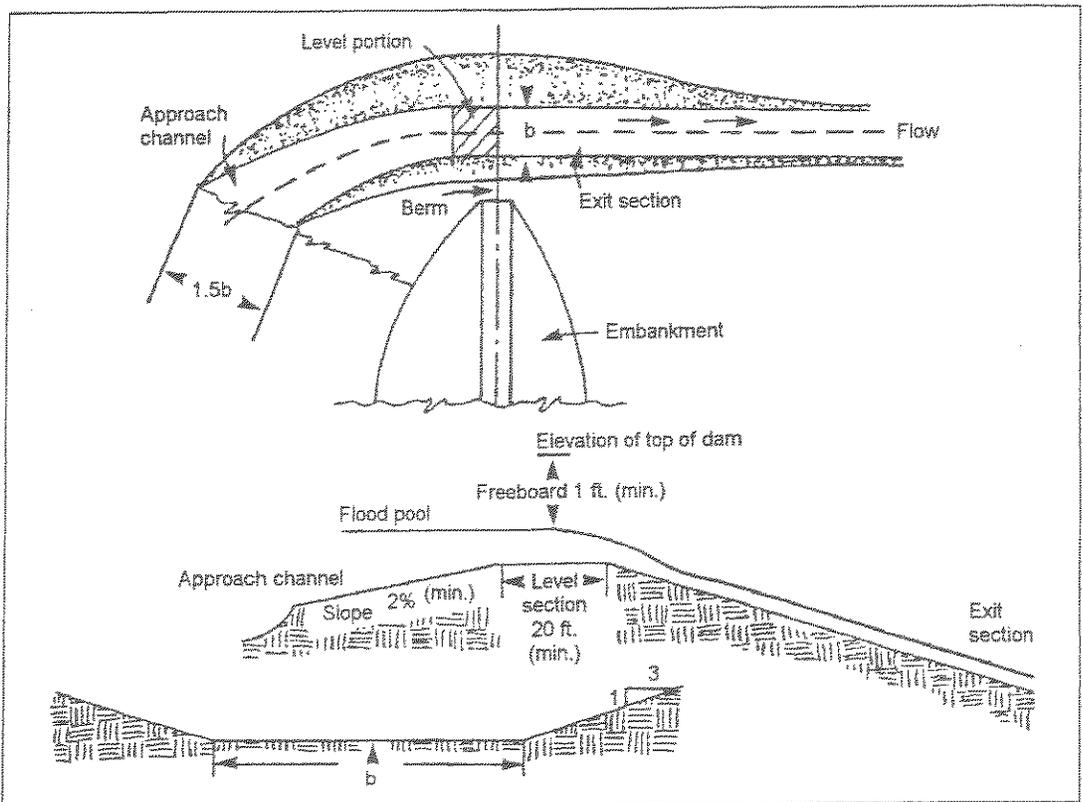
C. Plan, profile, and cross-section of an emergency spillway for a temporary sediment basin excavated in undisturbed soil.
